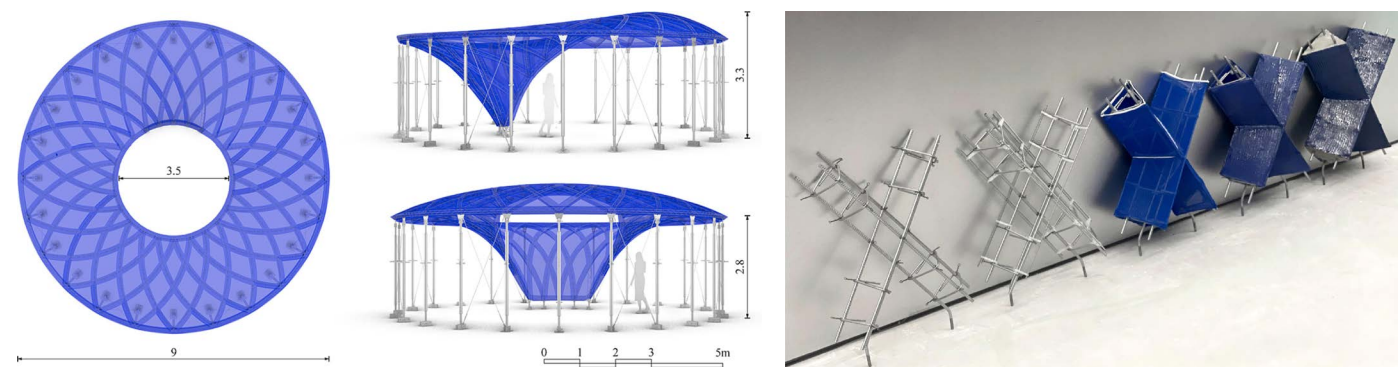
(A) Plan and elevation diagrams of KnitNervi, (B) Prototypes demonstrating the feasibility of the proposed construction system (Source (all): Scheder-Bieschin et al., 2023)
